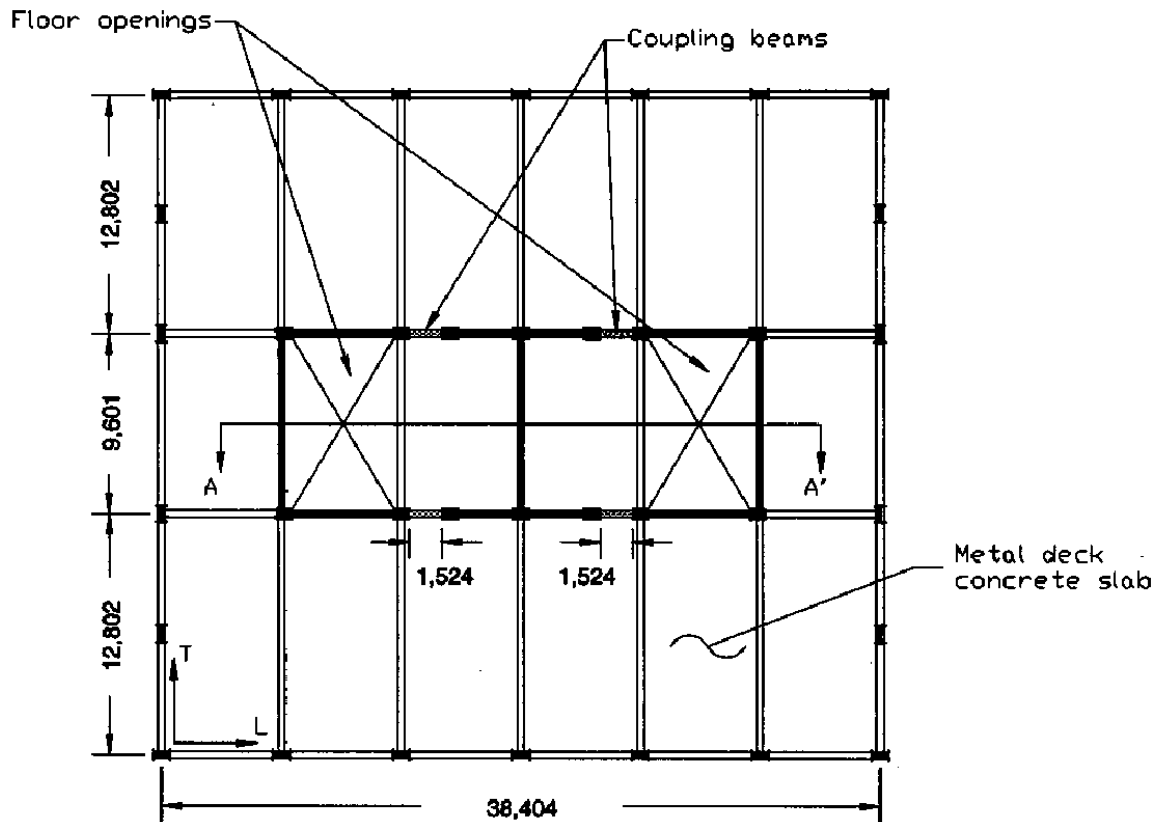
El-Tawil et al. 2002 (adopted from El-Tawil et al. 2002) Plan View of U.S.-Japan Theme Structure (all dimensions in millimeters)
